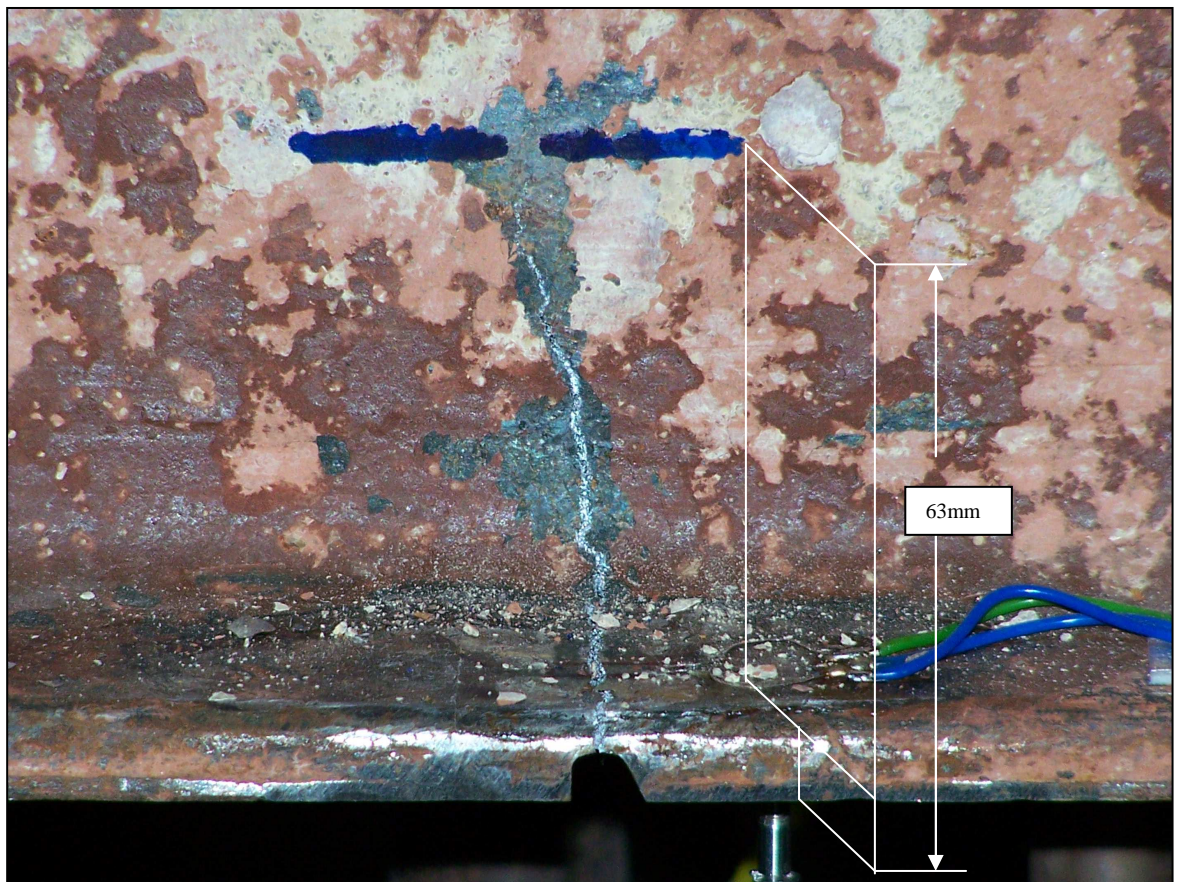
Close-up of crack in beam originating from blunt notch. (Photo by M.O'Sullivan 2008)
